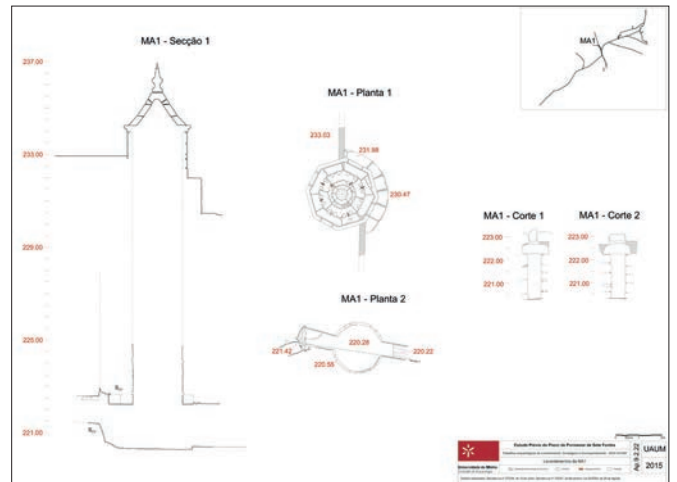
Freiras's head of water (MA.1) - Exterior and interior view; elevations and plans. © UAUM
